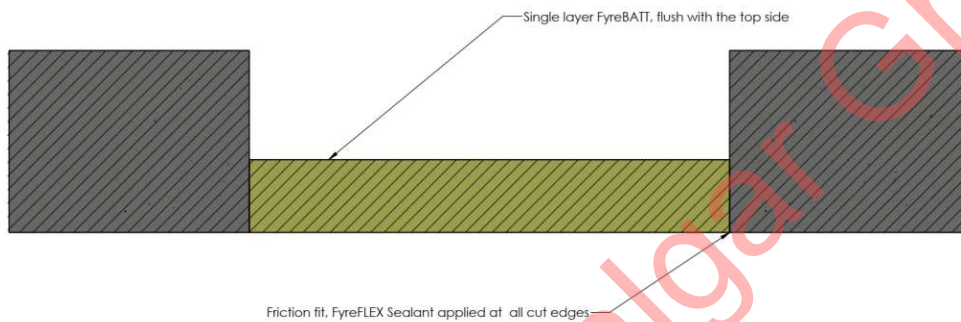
Blank seal protected with single layer of Trafalgar FyreBATT in floors
